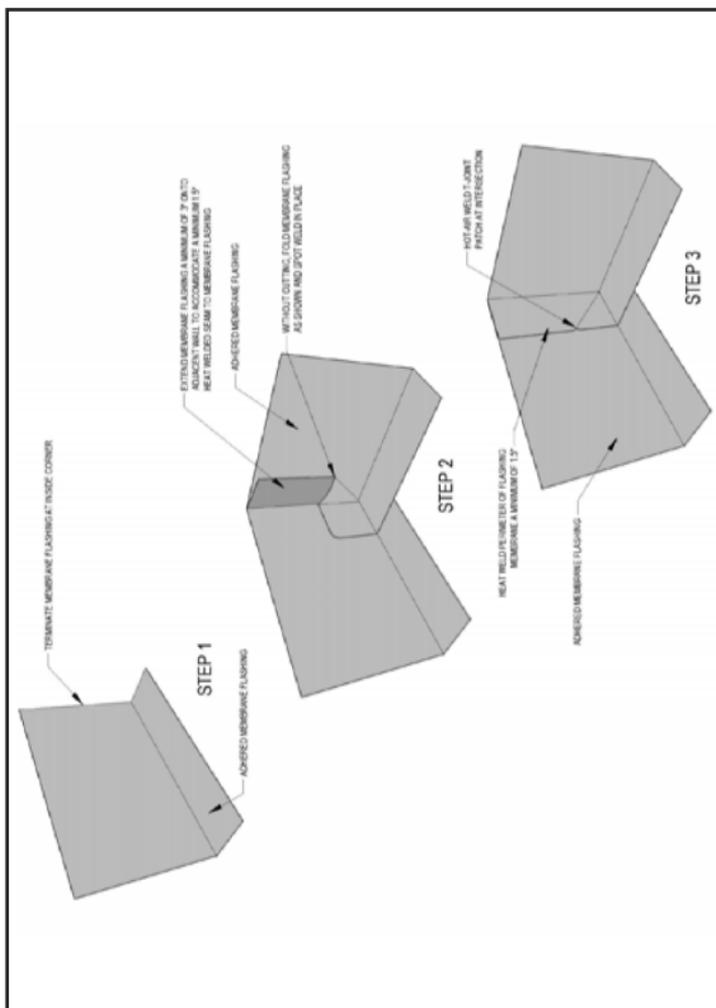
Adhered PVC Flashing Membrane At Field Fabricated Inside Corner
